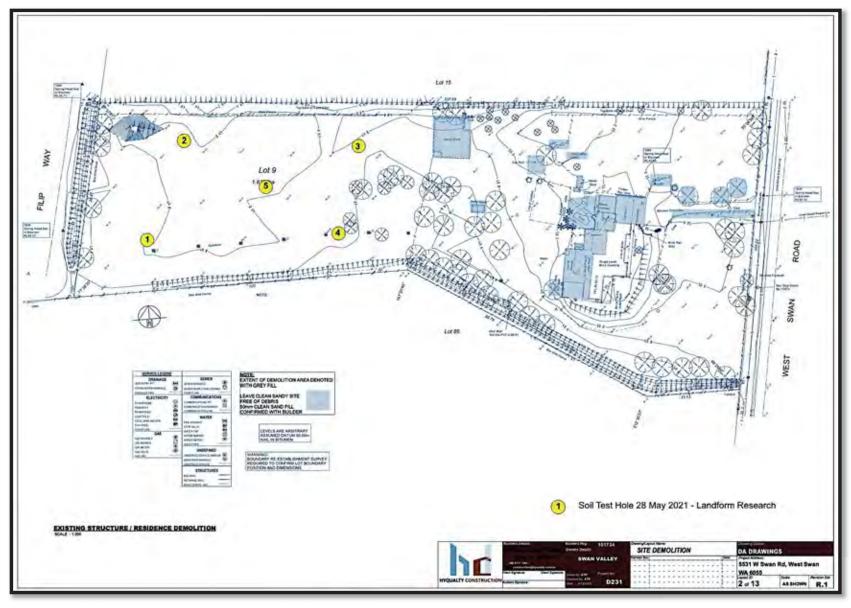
Contour Plan and Soil Test Holes. Note the Local datum. The land is at 17 metres AHD
